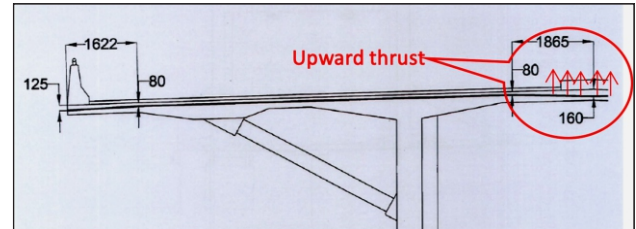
Transverse prestressing cable layout providing upward thrust in deck slab at location of laminar cracks
